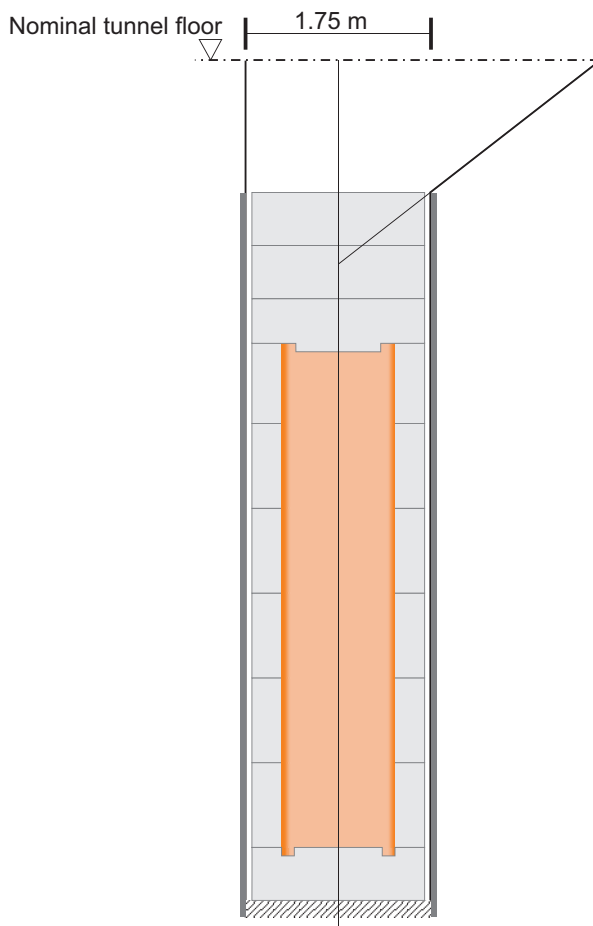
The deposition hole dimensions in the reference design considered for this report.
